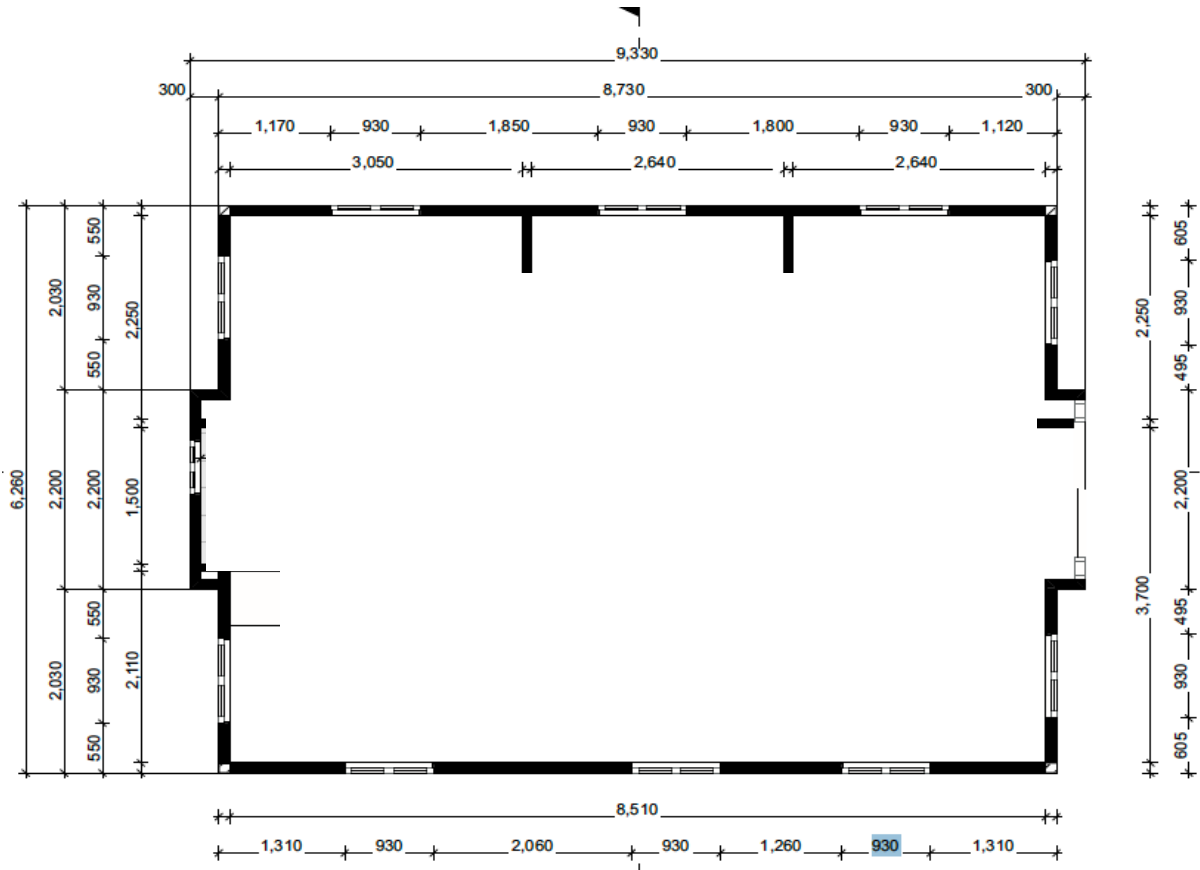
Floor Plan of the temporary dwelling the subject of this retrospective use application
